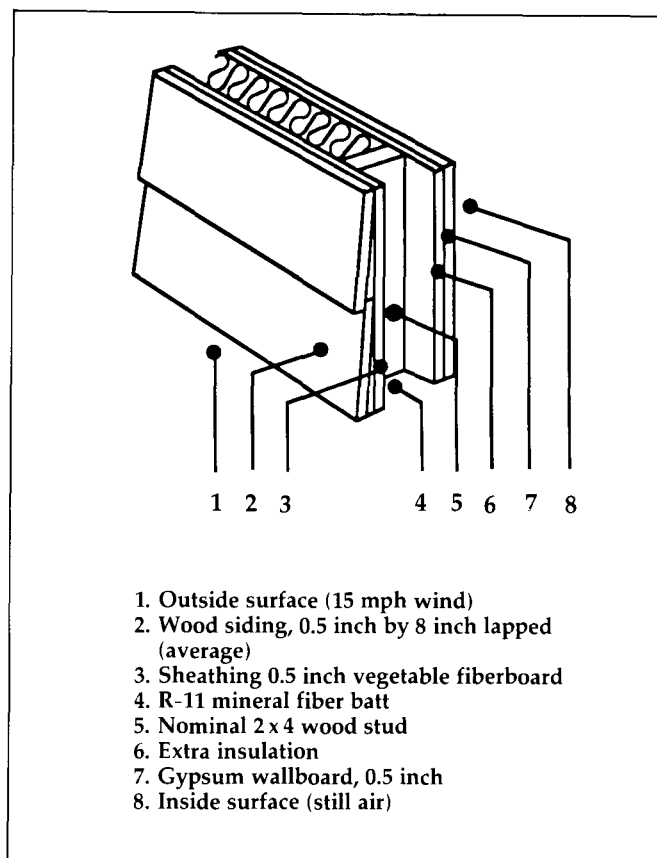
A 2x4 wall cavity with an extra insulation board on the inside.
